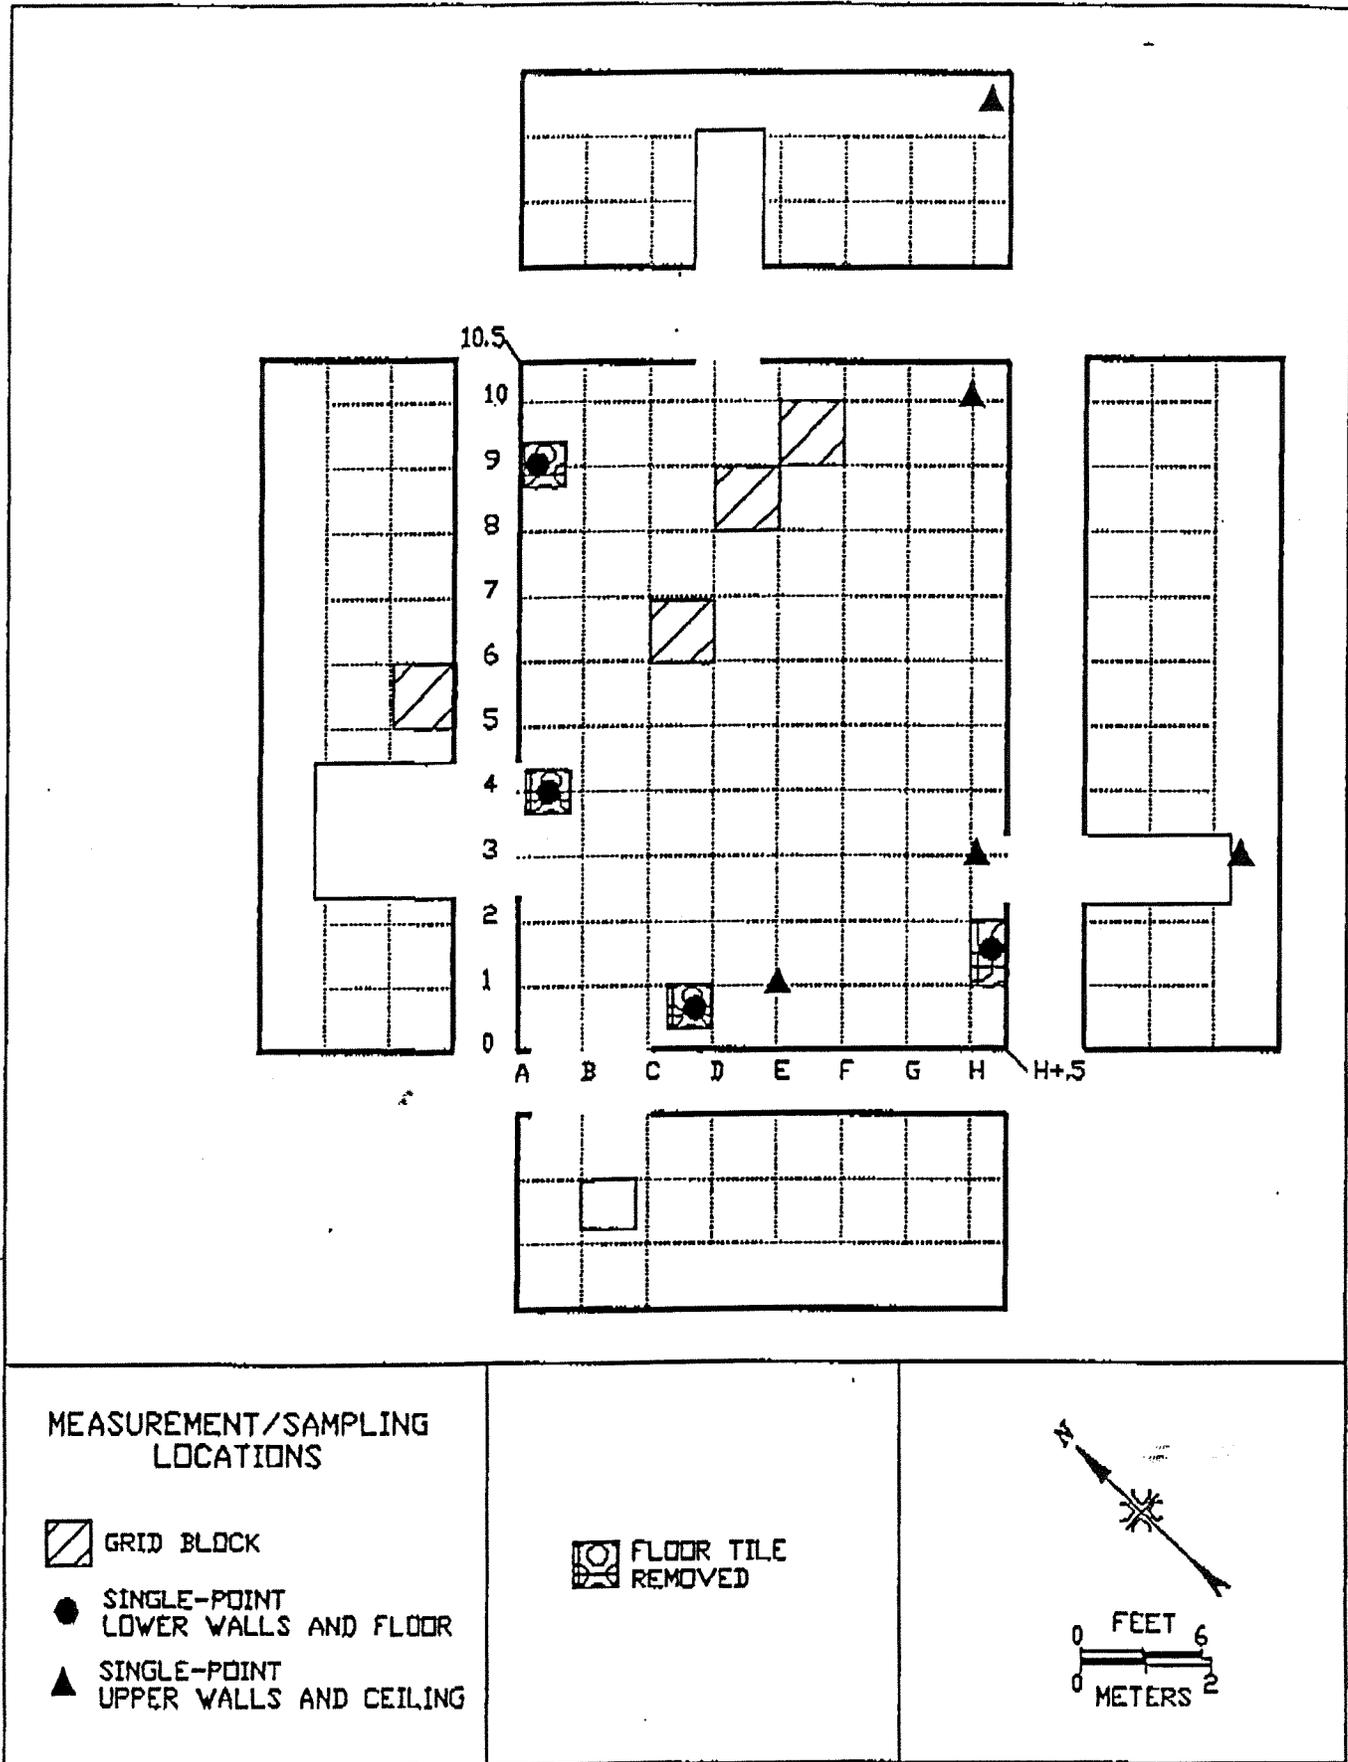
Building 005, Room 115 - Measurement and Sampling Locations
